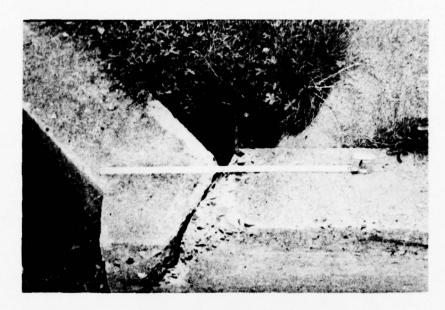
Erosion and settlement of wingwall at left side of approach to masonry spillway.
